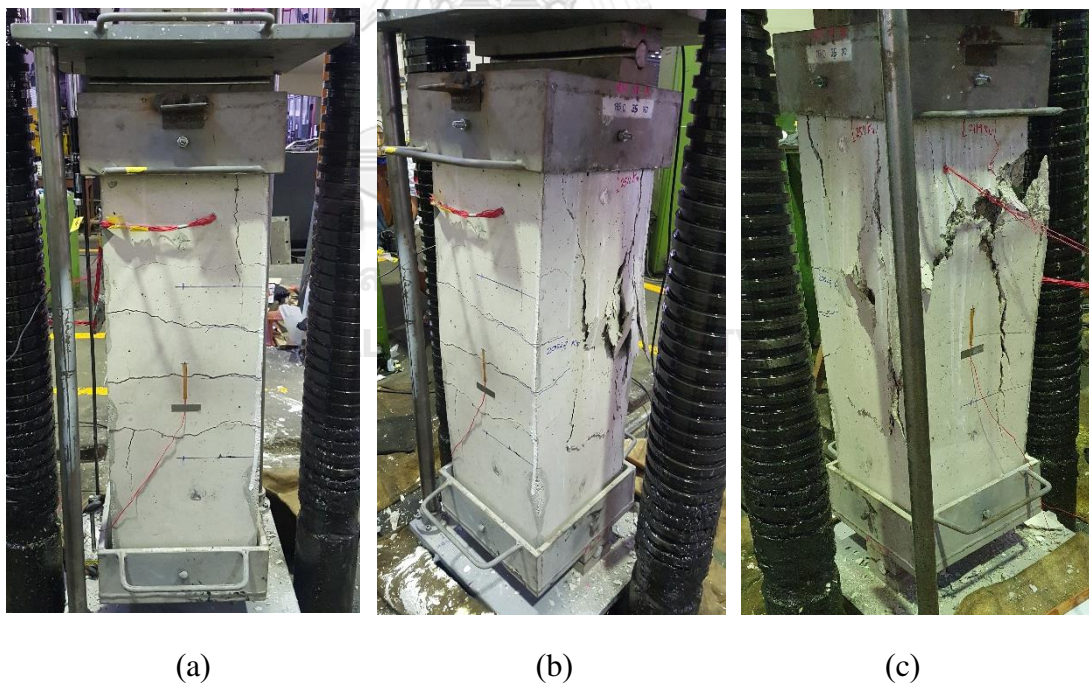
Failure of CECS column C2s-63-E1; (a) tension side; (b) side view; and (c) compression side.
